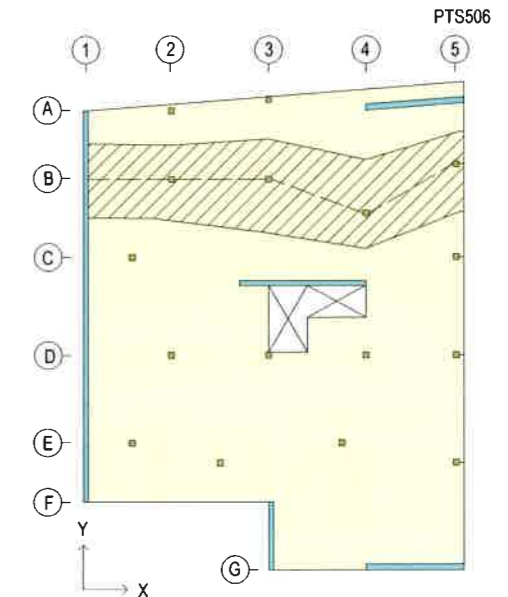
Delineation of a Design Strip in a Floor System
